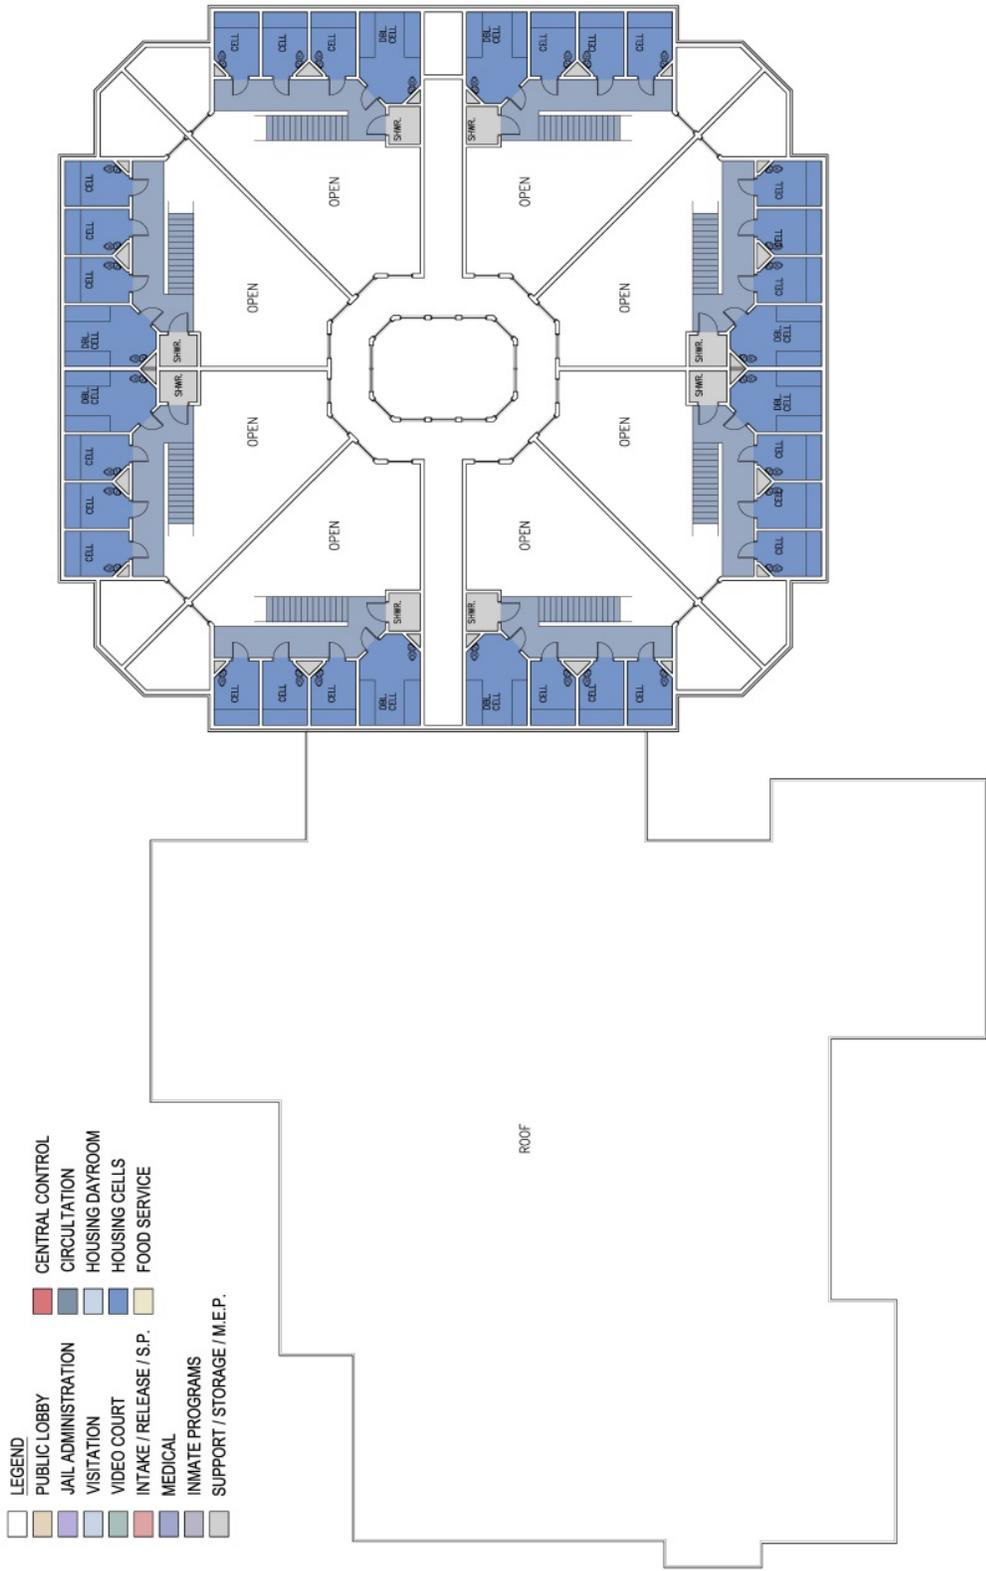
Alternative B – Expansion and Renovation Plan – Mezzanine (64/128 Bed Capacity, only Jail Portion of Facility shown in this diagram)
